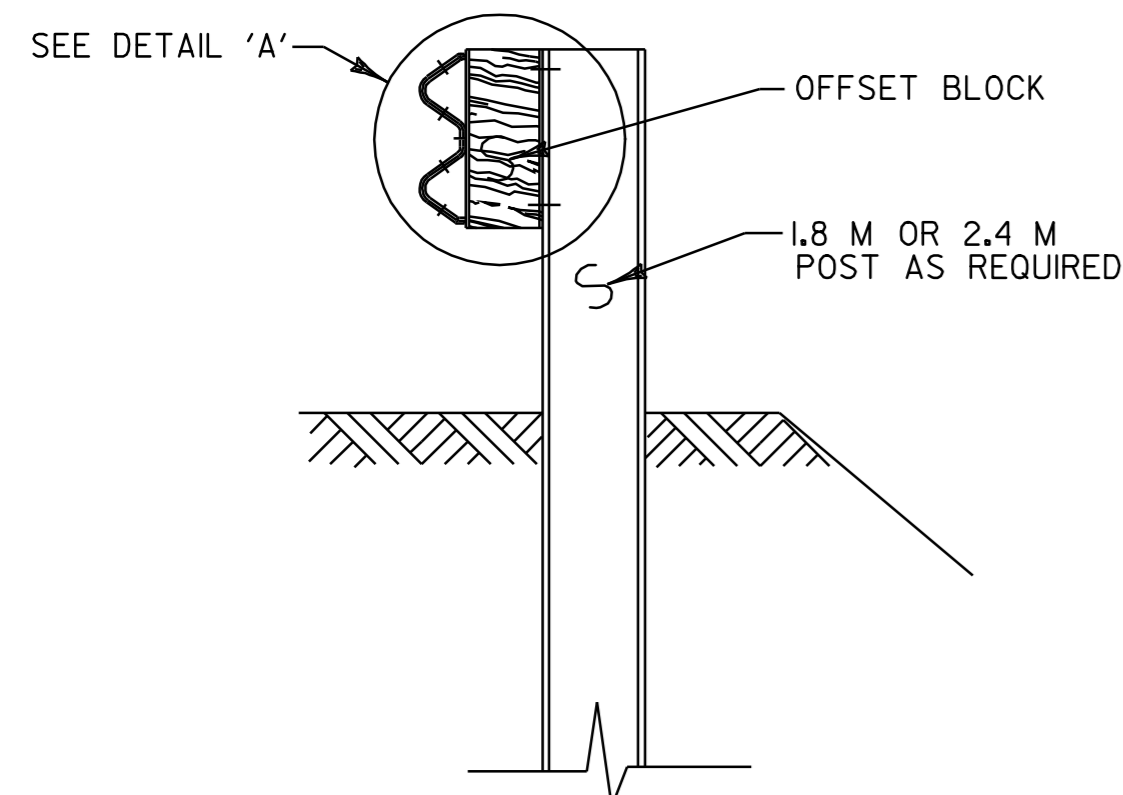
DETAIL OF STEEL BEAM GUARD RAIL AT LARGE CULVERTS
